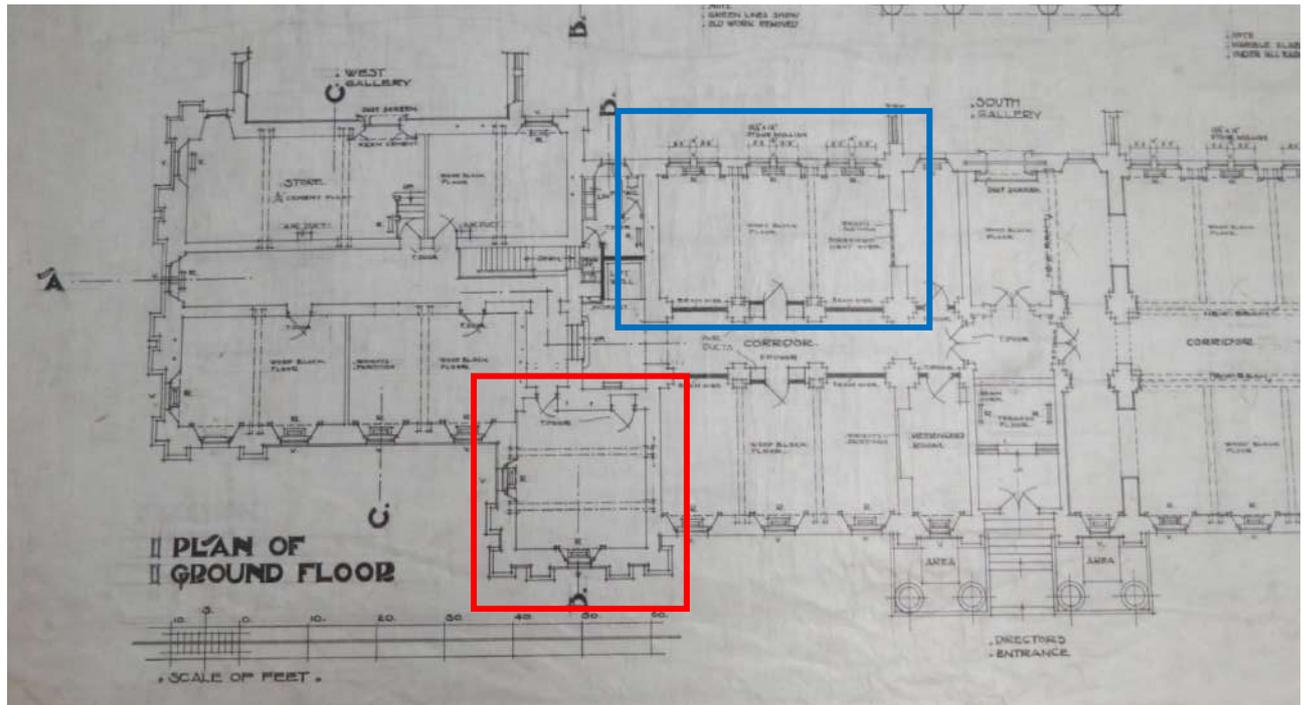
Office of Works, National Gallery: West Wing. Plan of ground floor and gallery floor (number 2). Scale: 1 inch to 8 feet (detail), 9 August 1910
